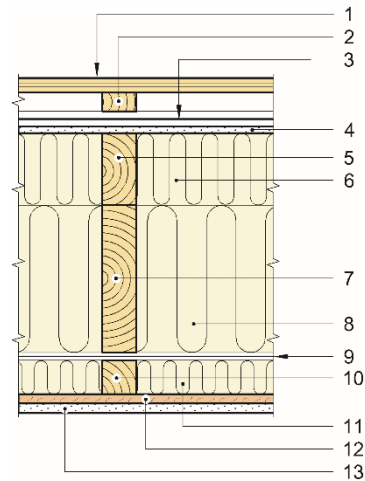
shows the principle design of floor structures. Fig 5 shows the principle design of floors between house units. Standard element width is 1200 mm, and the structures are based on joists spaced c/c 300, 400 or 600 mm with dimensions and spans according to SINTEF Building Research Design Guide 522.351.
